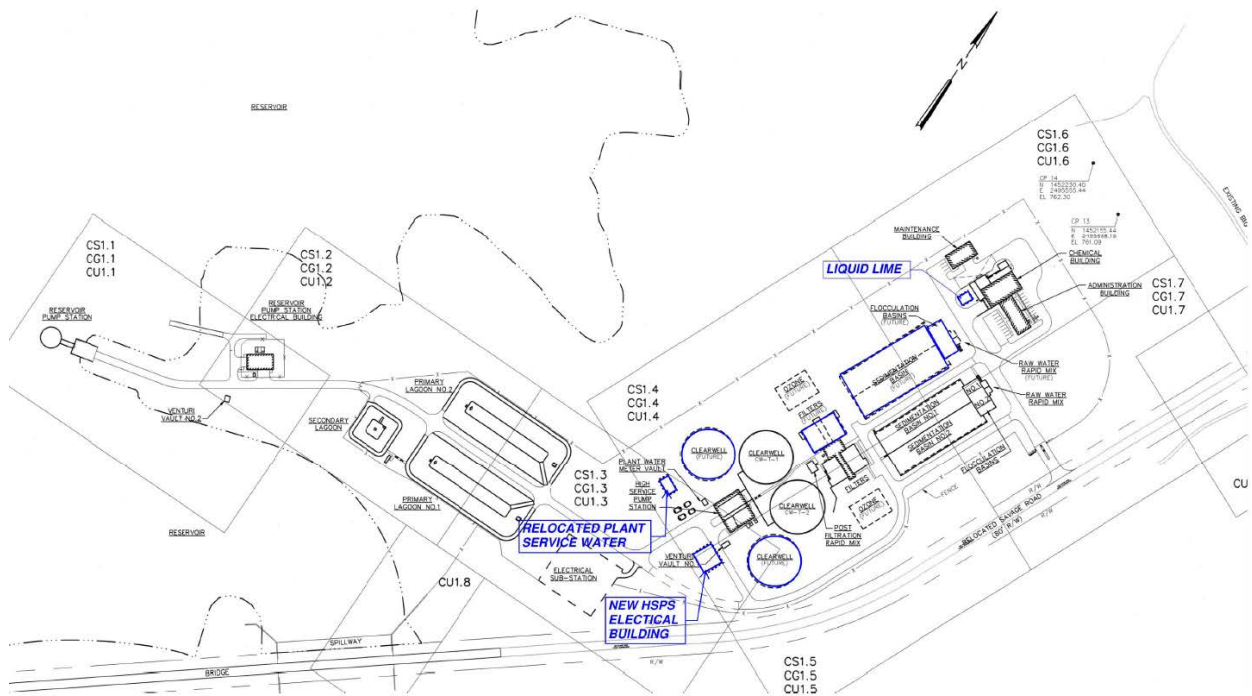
Proposed Bear Creek WTP Site Plan Expansion to 42 mgd
